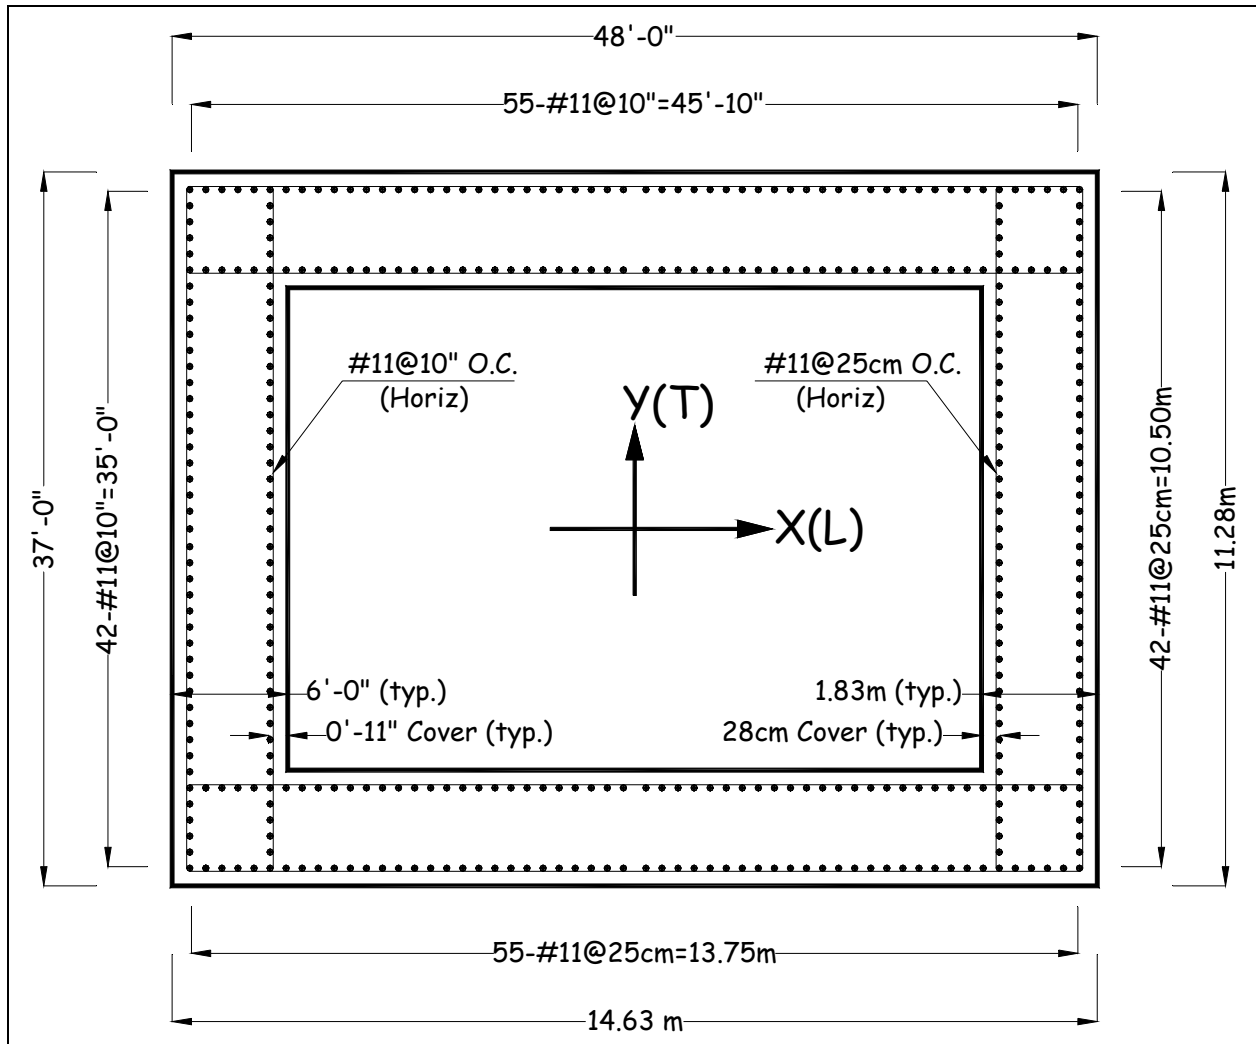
Reinforcing bar arrangement after the design for shear resistance
